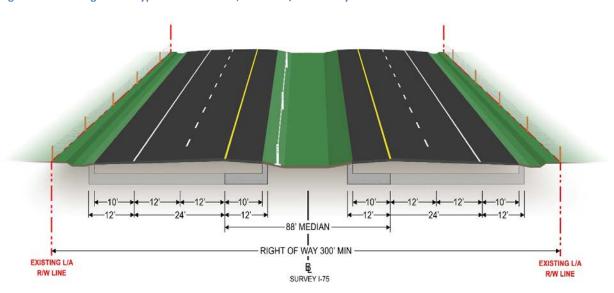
Existing 4 Lane Typical Section - I-75, Charlotte/Lee County Line to Tuckers Grade
